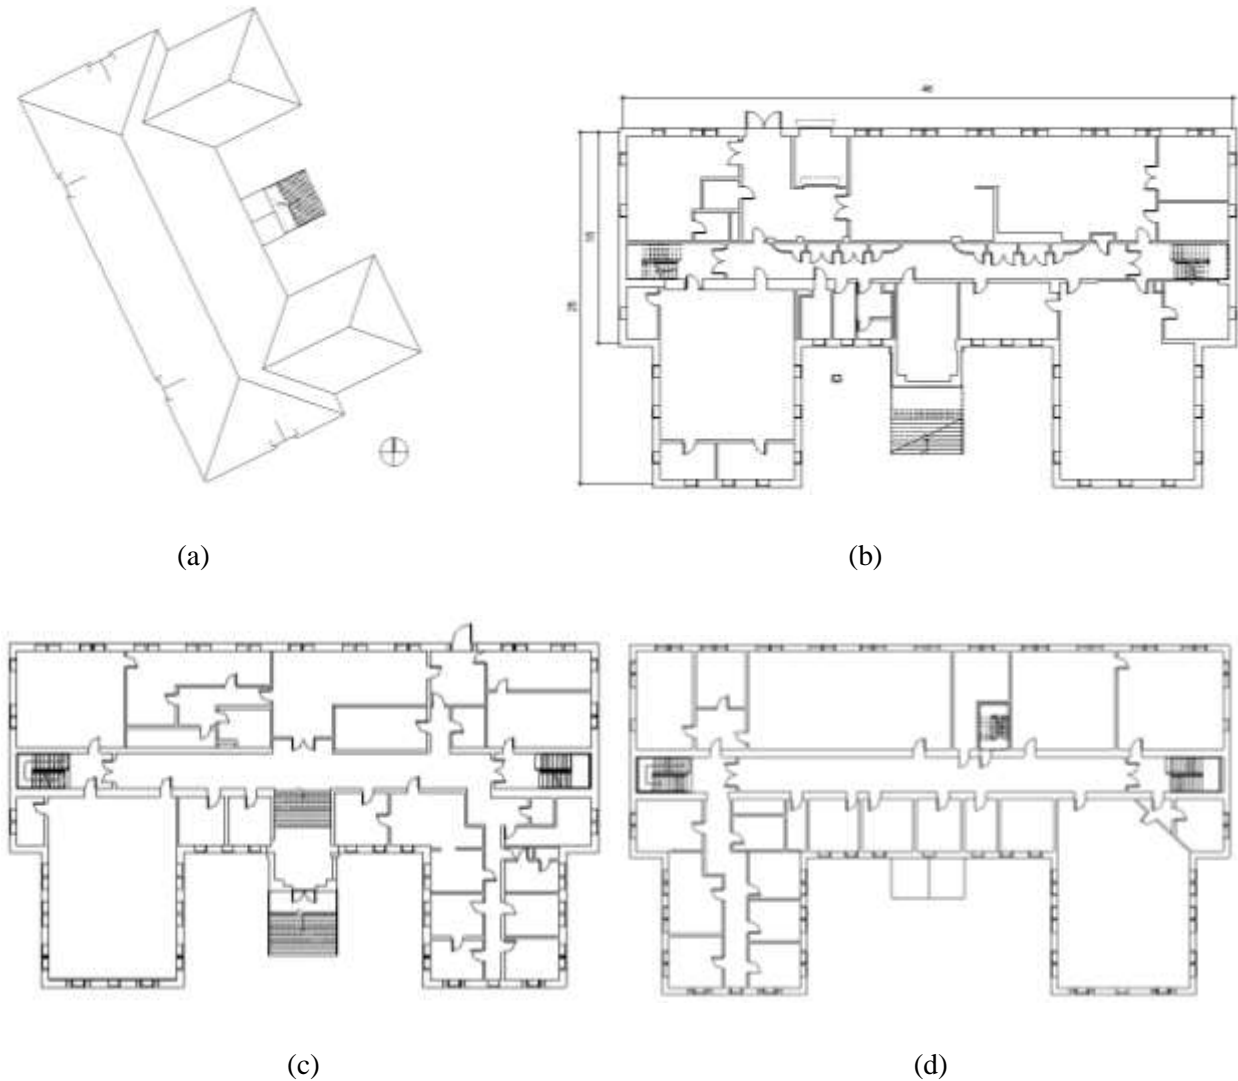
Site plan (a), basement (b), first(c) and second (d) floor plan of Kaven Hall
